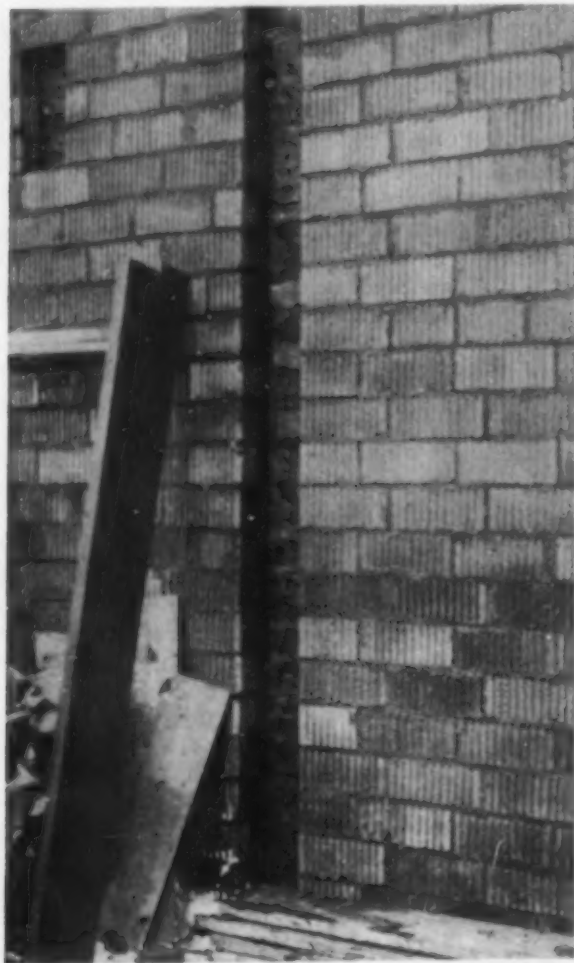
TYPICAL DETAIL OF EXTERIOR
